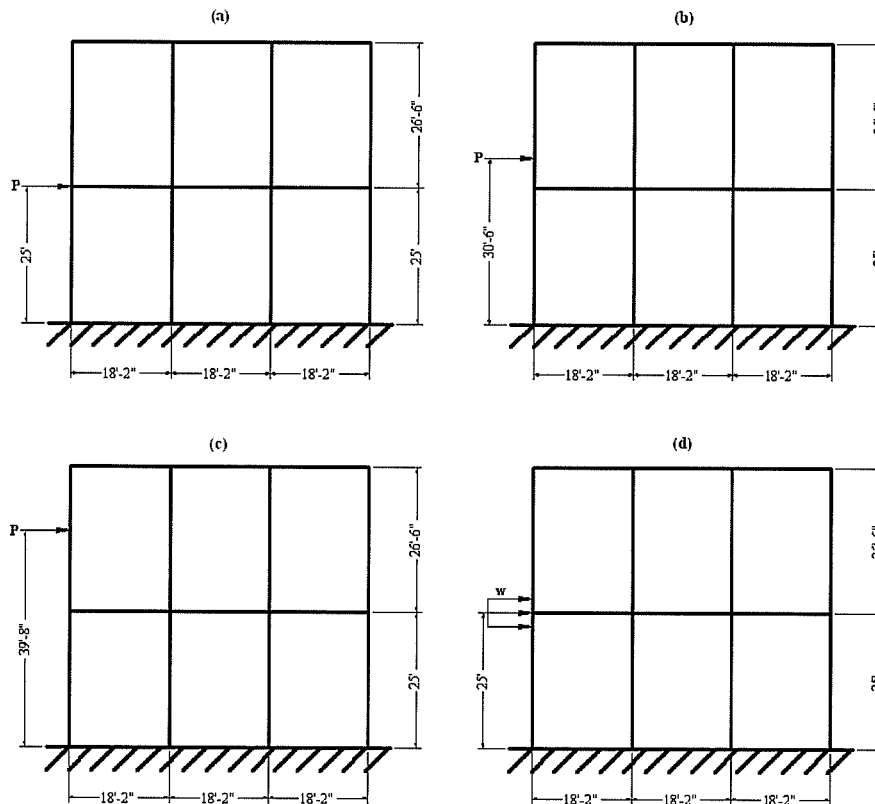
IH-10 Impact Load Locations: (a) Load Location 1: Point Load at Beam, (b) Load Location 2: Point Load at Normal Water Level, (c) Load Location 3: Point Load at High Water Level, (d) Location 4: 60-inch Wide Distributed Load at Beam
